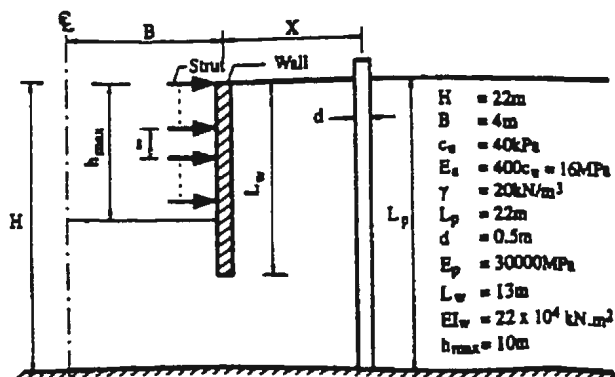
Pile close to an excavation, after Poulos and Chen, 1997
